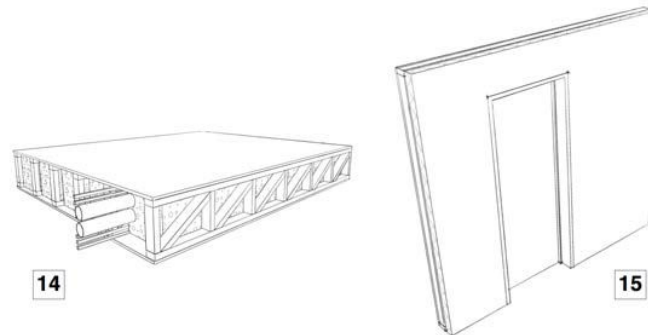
Fully finished floor cassettes (No. 14). Fully finished wall panel (No. 15)
